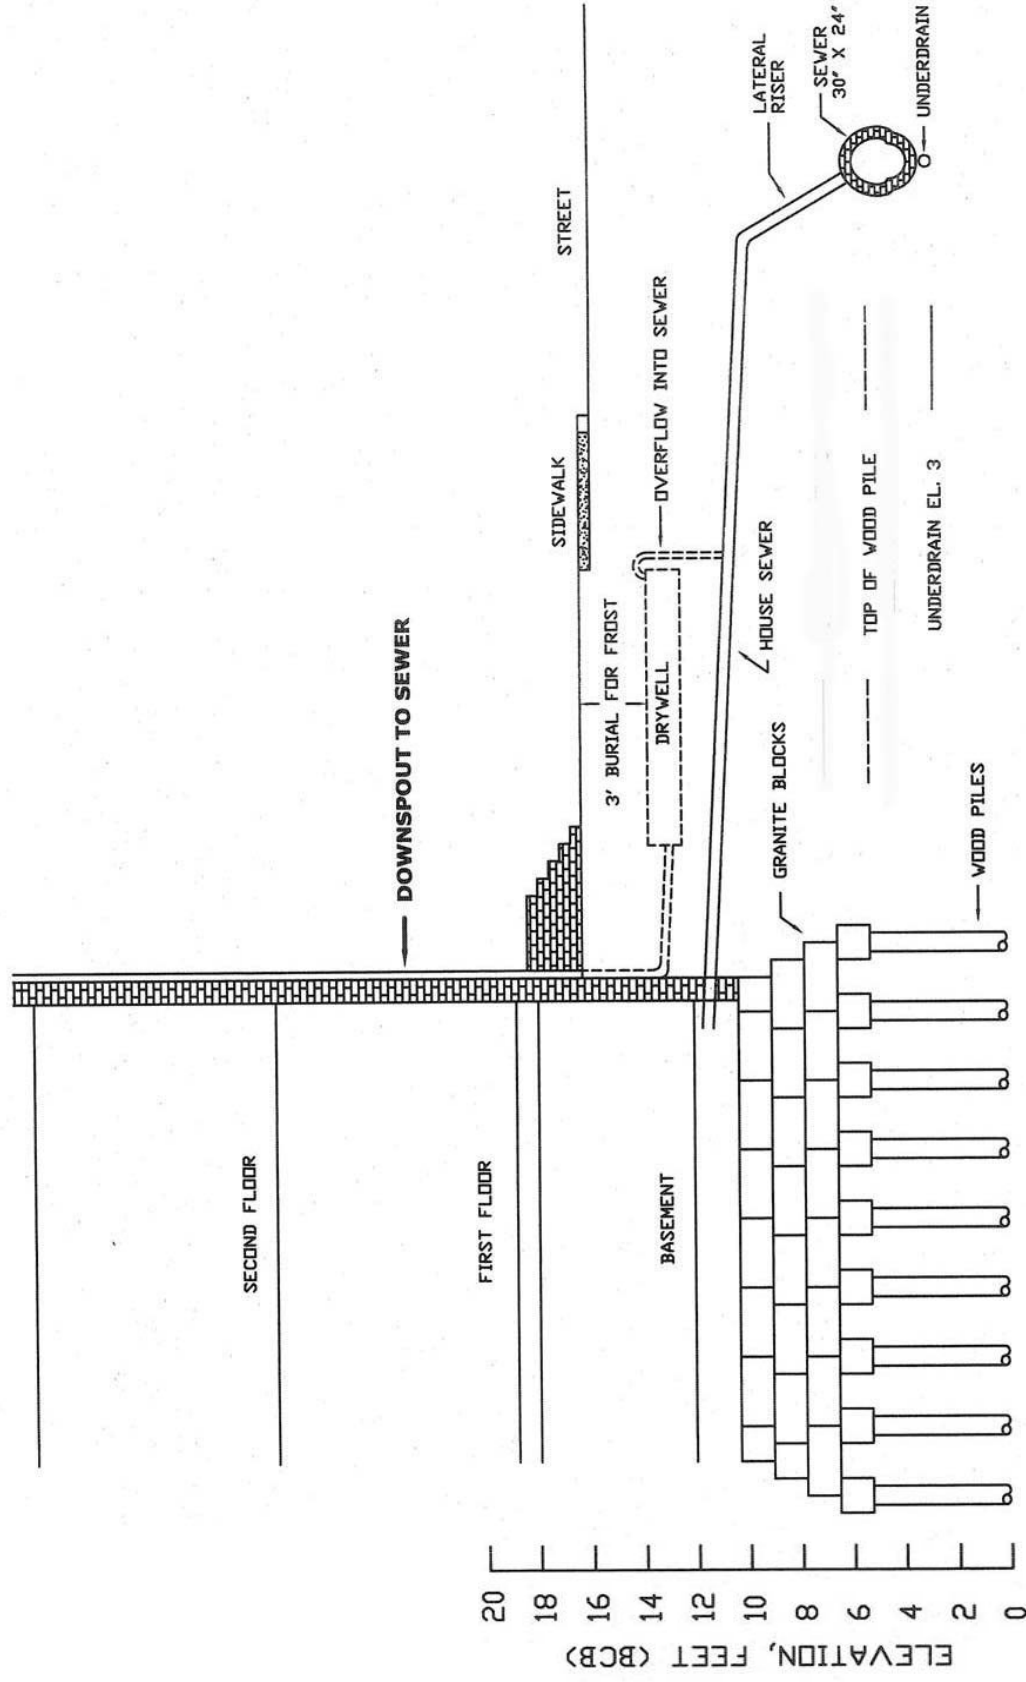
Cross Section View of Rowhouse Sewer Connection Showing Potential Recharge Drywell
